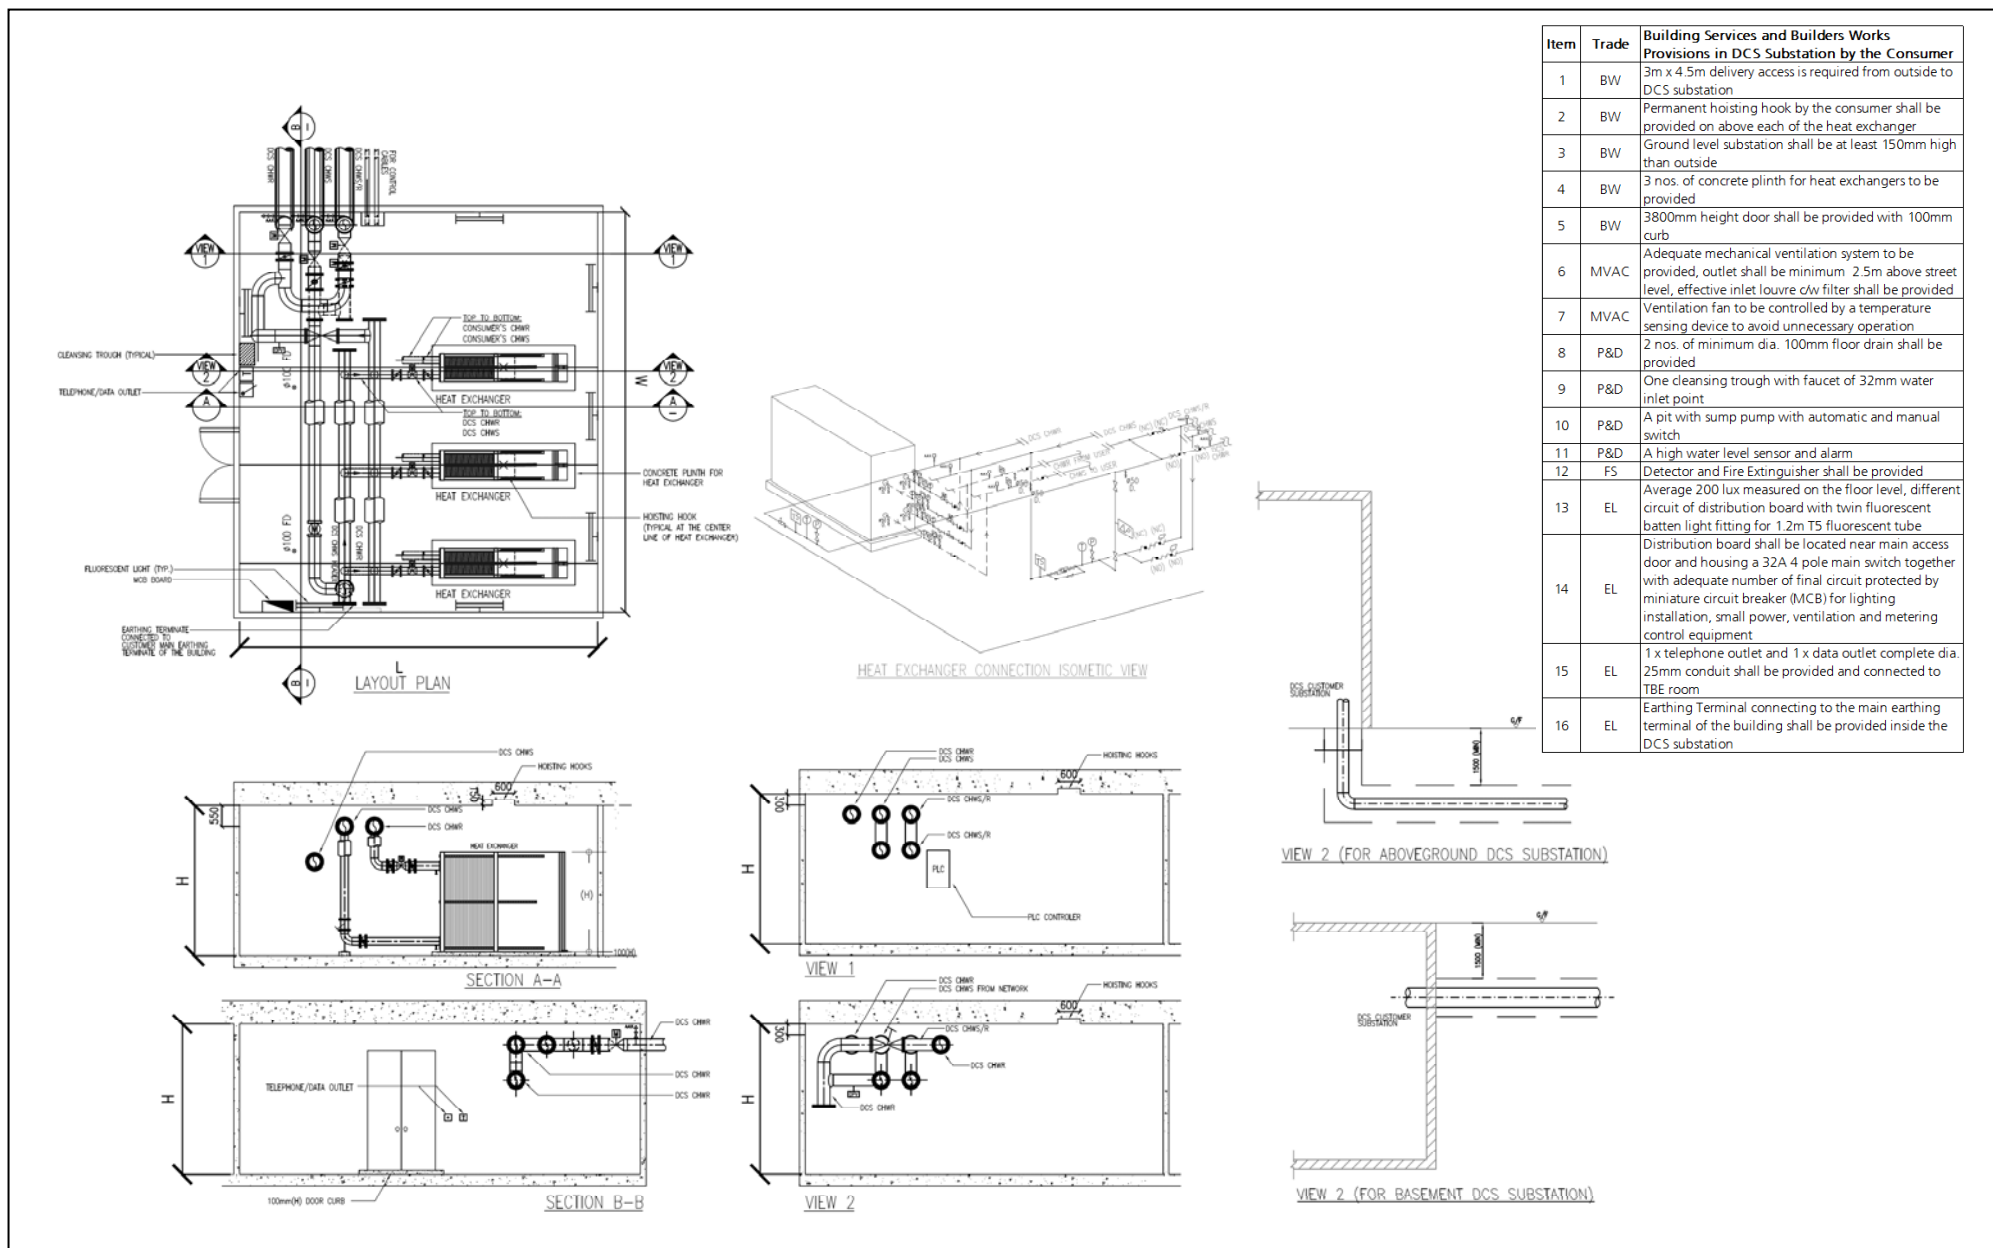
Typical Layout of Substation of Three Heat Exchangers
